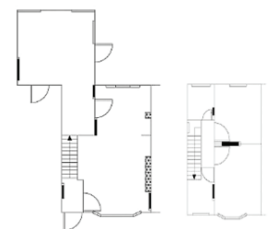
Ground floor layout (left) and first floor (right) layouts, both with radiator positioning in solid black
